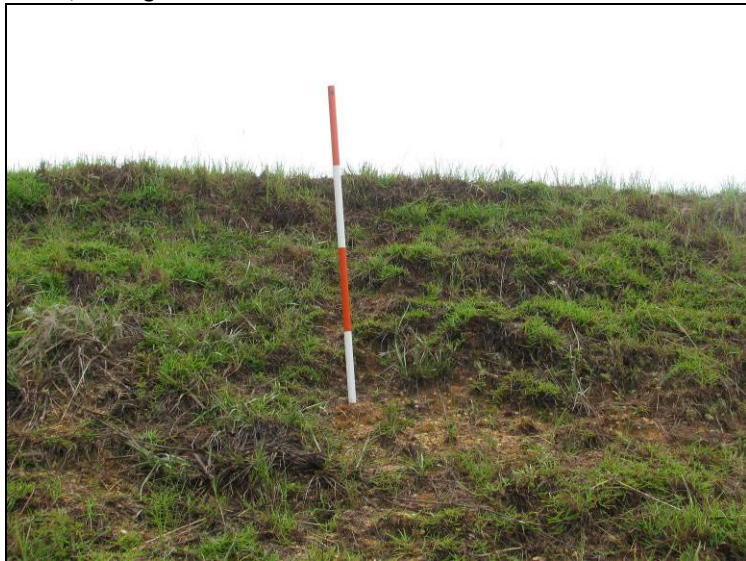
Ash Pond – West embankment exterior slope sloughing, looking east.
